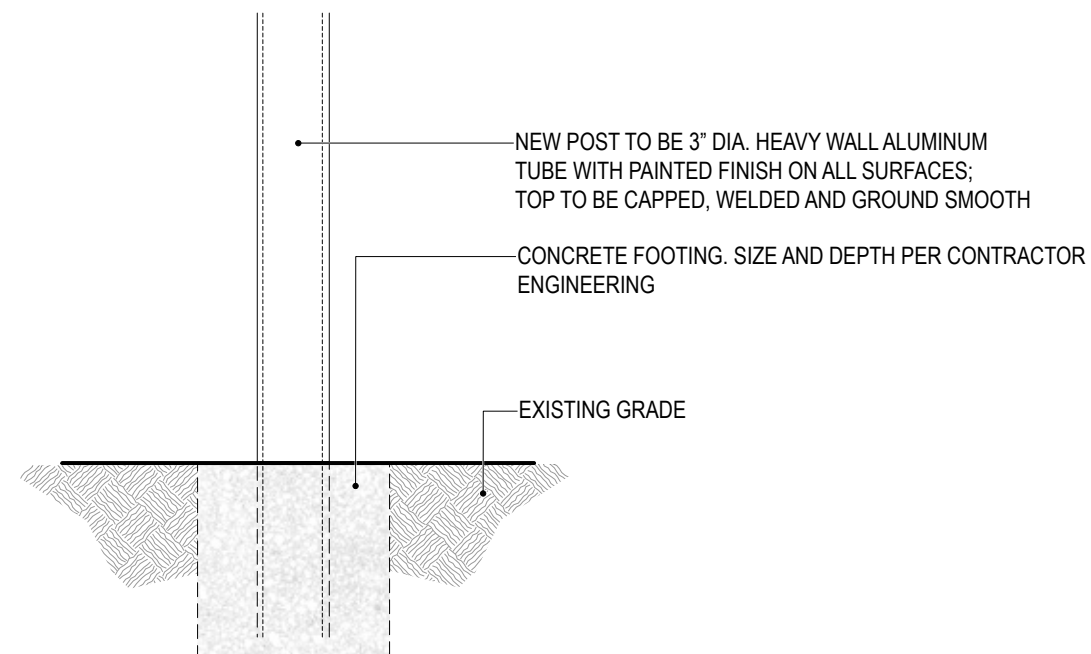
DETAIL | PERF OR SOLID TELES PAR SET INTO PAVEMENT | SCALE: 1 1/2" = 1'-0" | (A)
